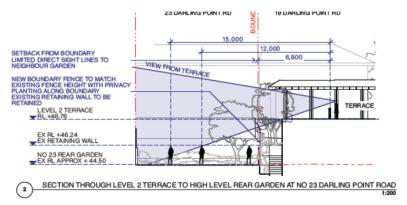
Sight line from the second floor rear balcony and the rear of No.23 Darling Point Rd.
